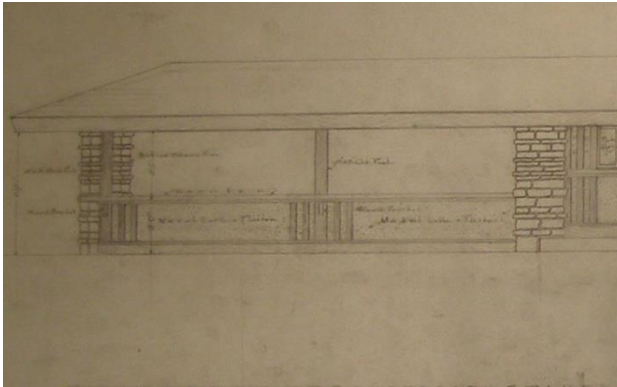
Original drawing of the open-air structure. (Source: Dubuque Museum of Art).
